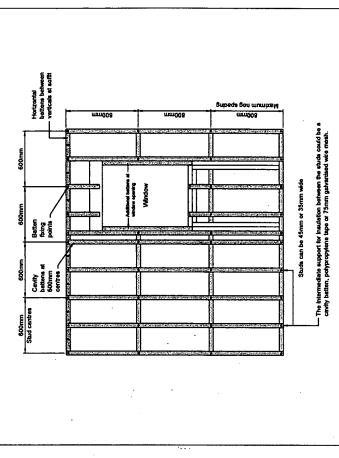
CAVITY BATTEN LAYOUT AT WINDOW OPENING
